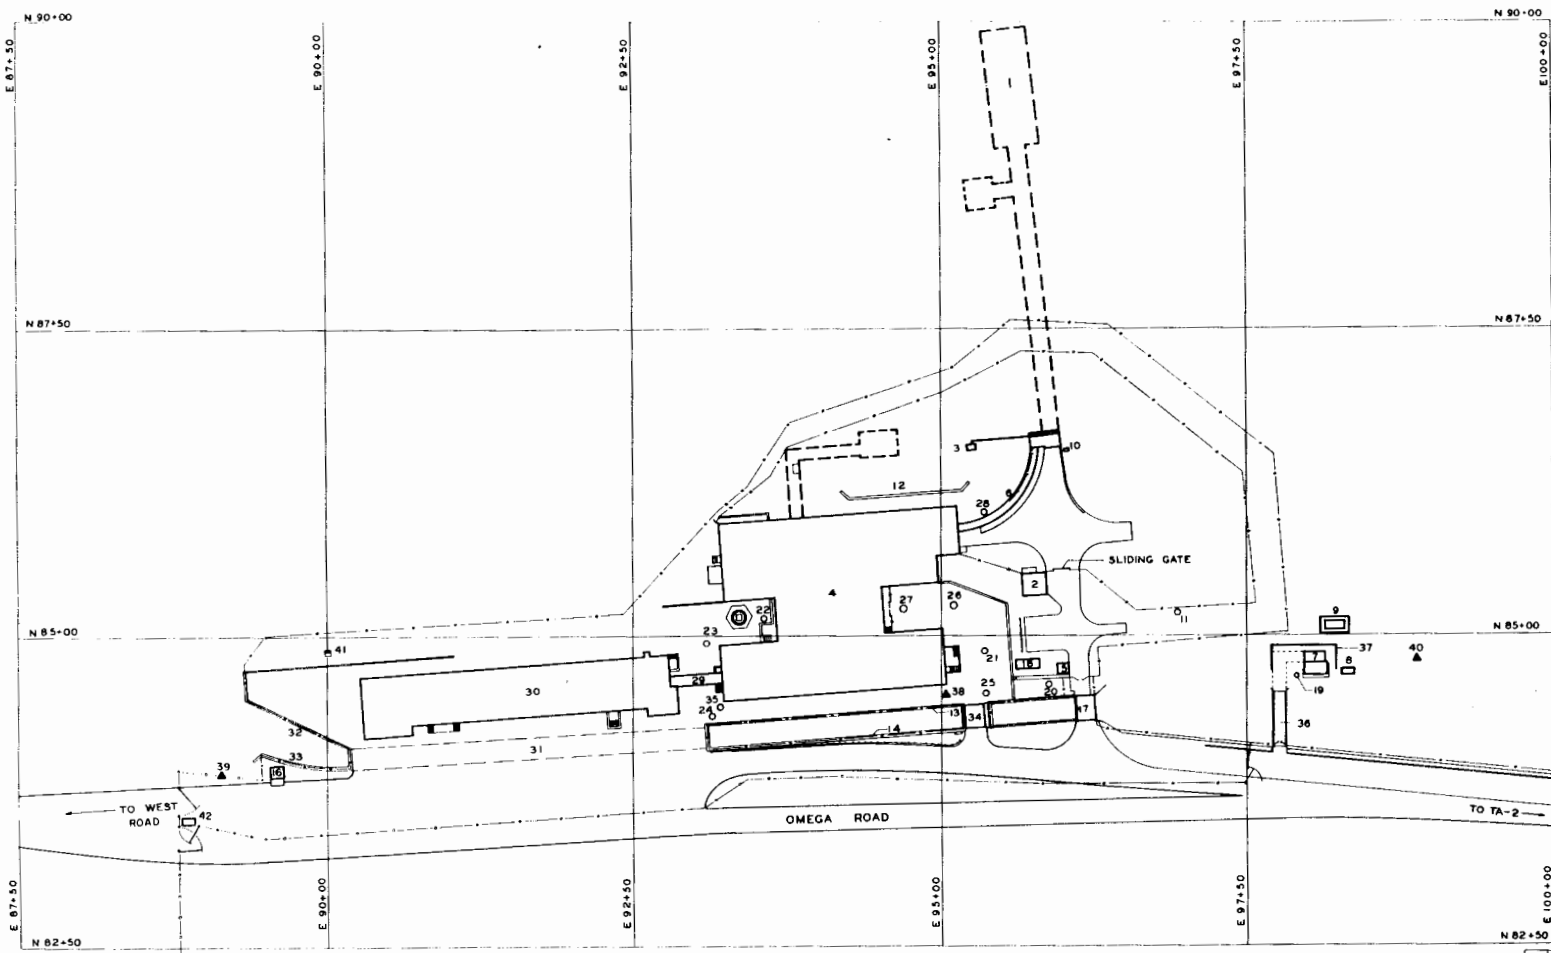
Structure Location Plan for TA-41 - W Site
